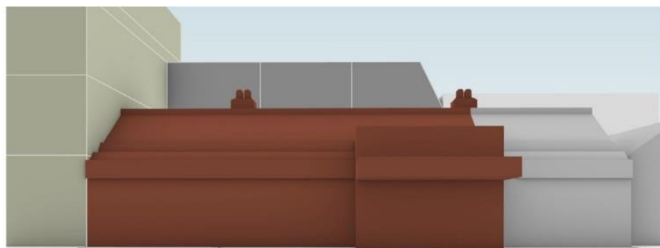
3D modelling showing the recommended built form outcome, looking west from the southern footpath of Swan Street
